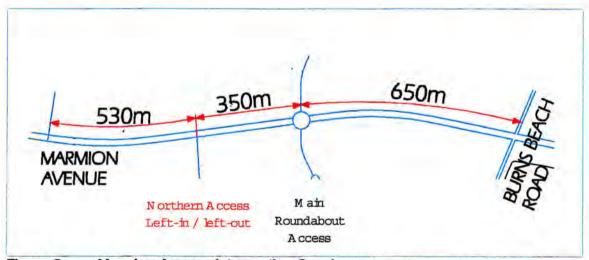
Marmion Avenue Intersection Spacing (Spacing subject to detail design)
